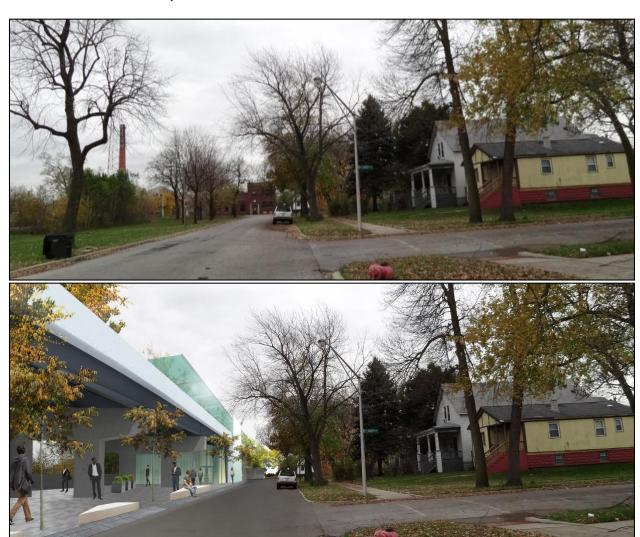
Photo of Existing Conditions and Photo Simulation of the Union Pacific Railroad Alternative West Option along Eggleston Avenue and Fernwood Parkway Facing 103rd Street
